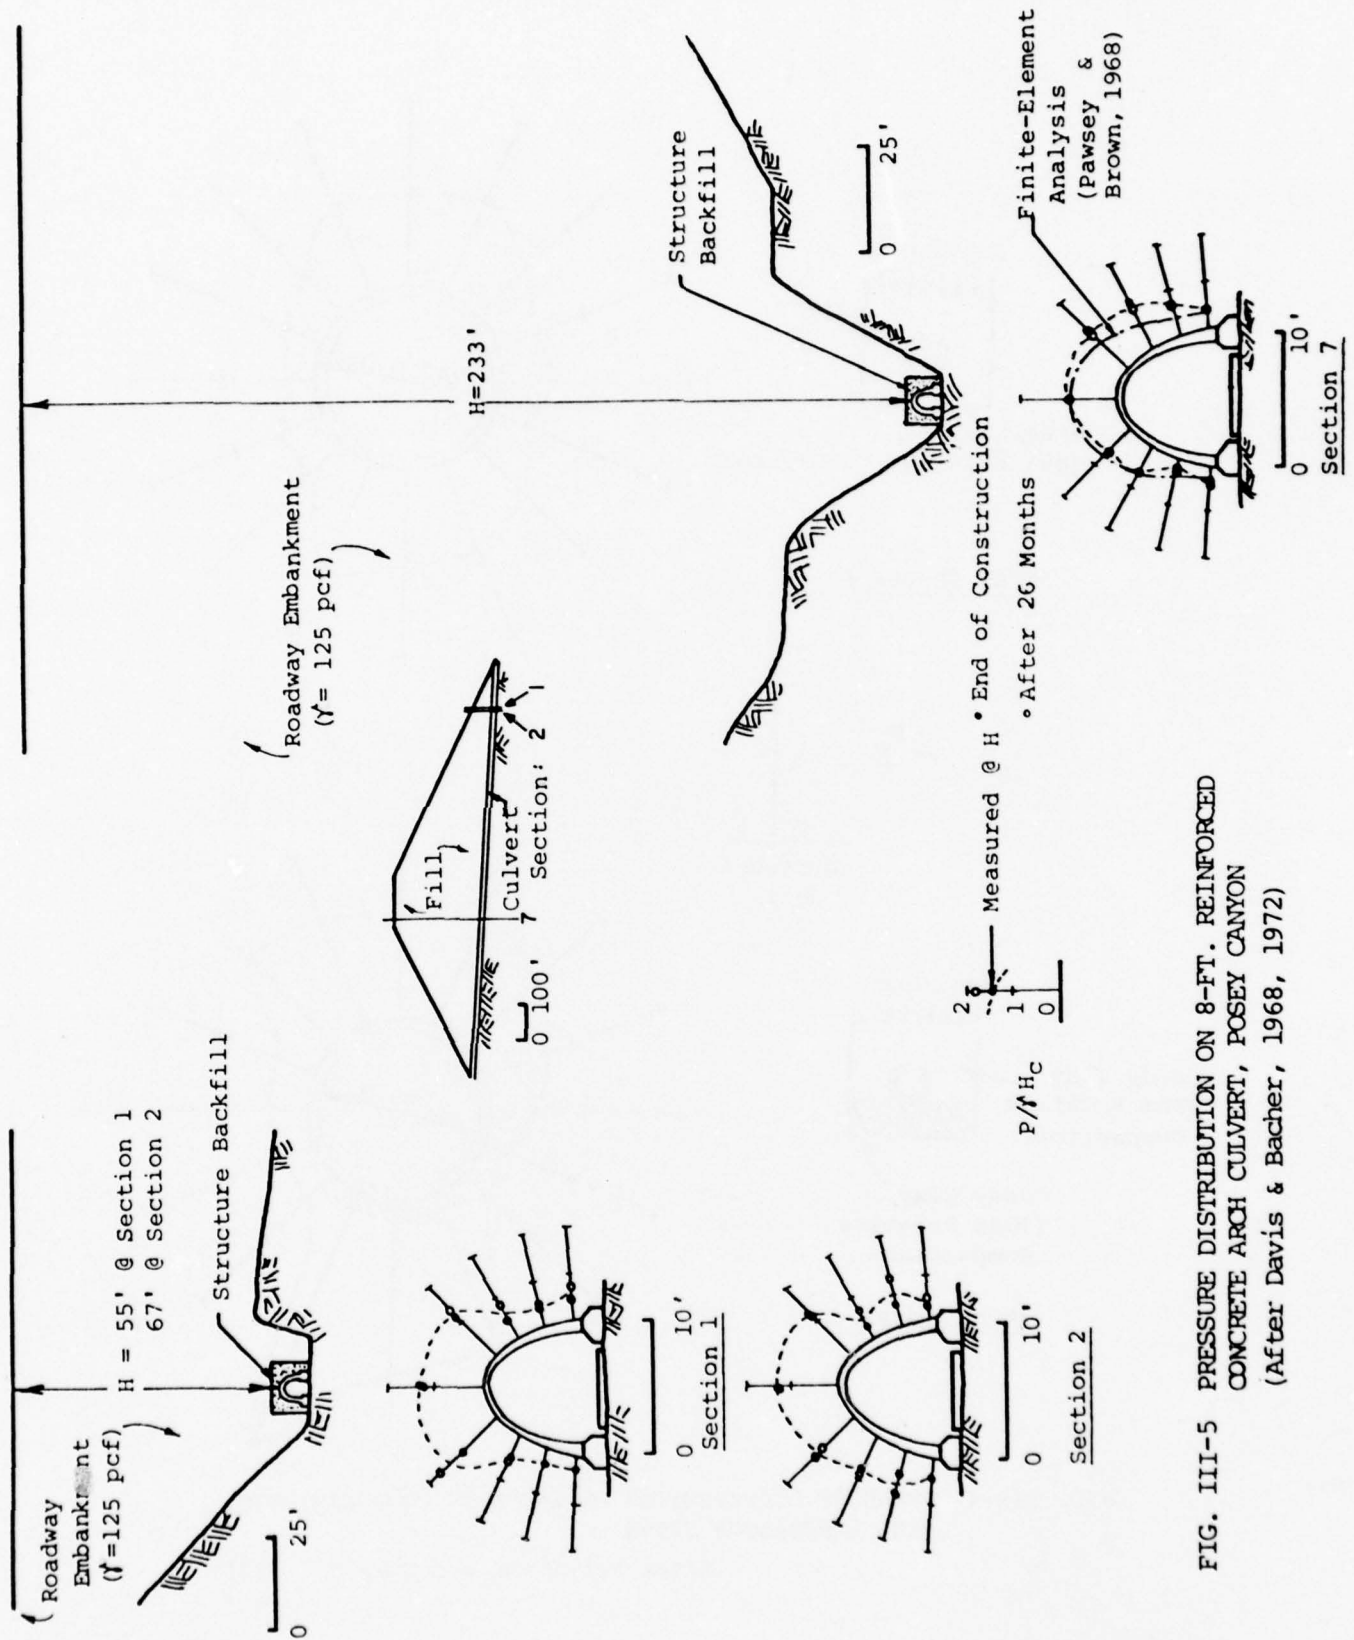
PRESSURE DISTRIBUTION ON 8-FT. REINFORCED CONCRETE ARCH CULVERT, POSEY CANYON (After Davis & Bacher, 1968, 1972)
